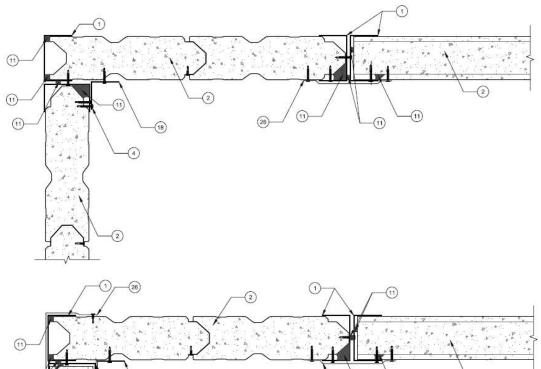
Arrangement of various Corner Details for vertical panels supported by floor
